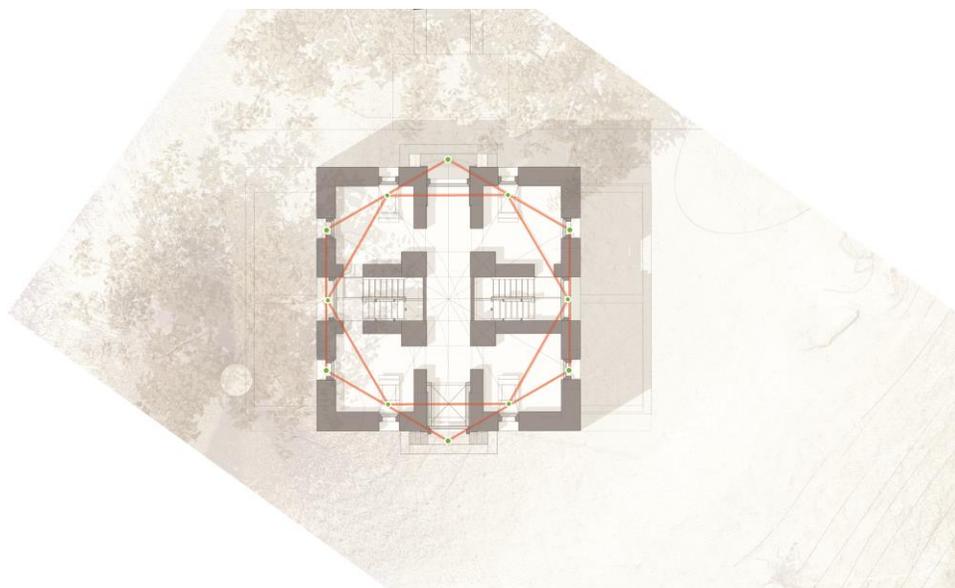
Blackwell Tower: Fourth Floor Plan Diagram
